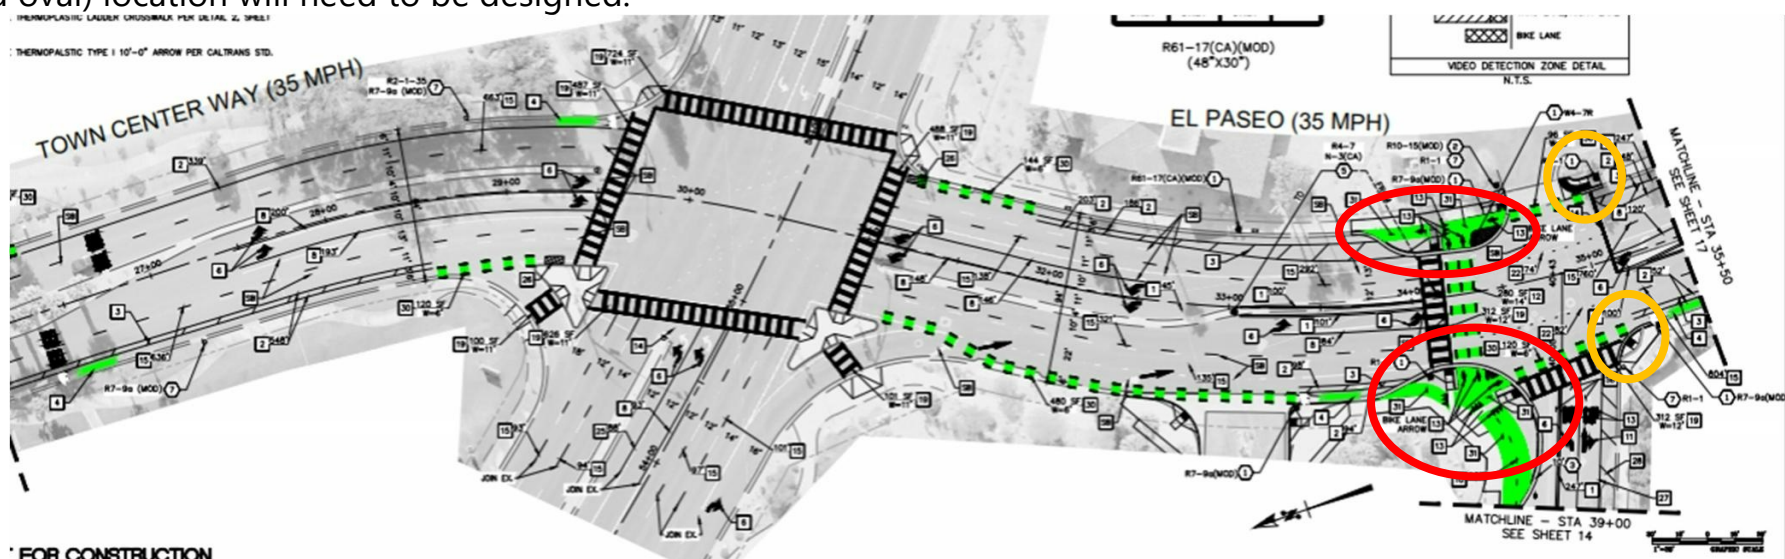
Concept – El Paseo/Painter's Path Bulb-outs & ramps
